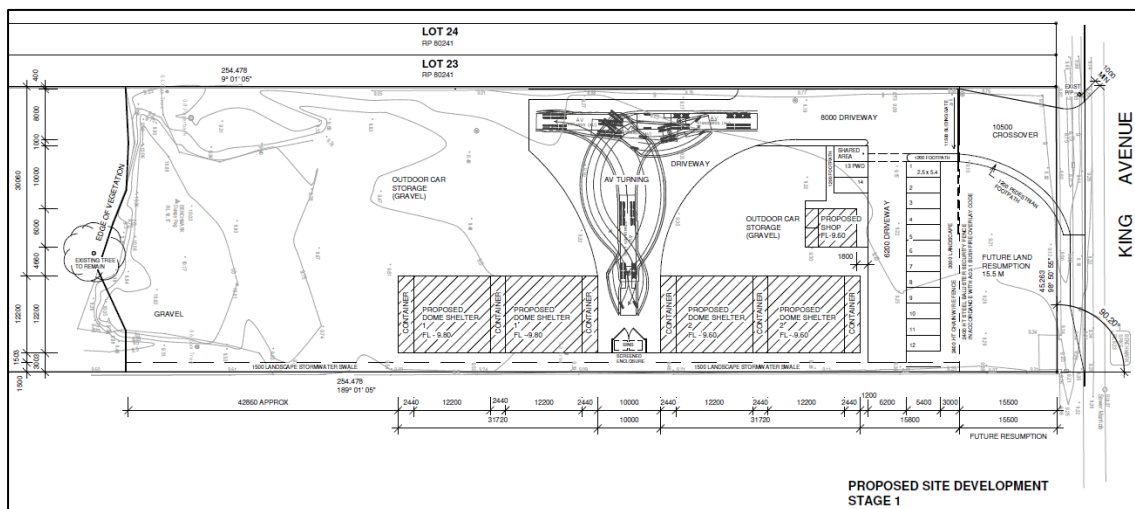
Approved Stage 1 Site Development Plan – The Design Studio (October 2025)
